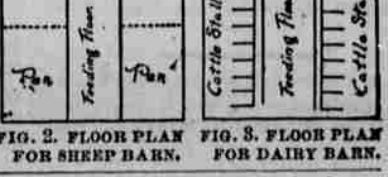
FLOOR PLAN FOR SHEEP BARN. FIG. 3. FLOOR PLAN FOR DAIRY BARN.
